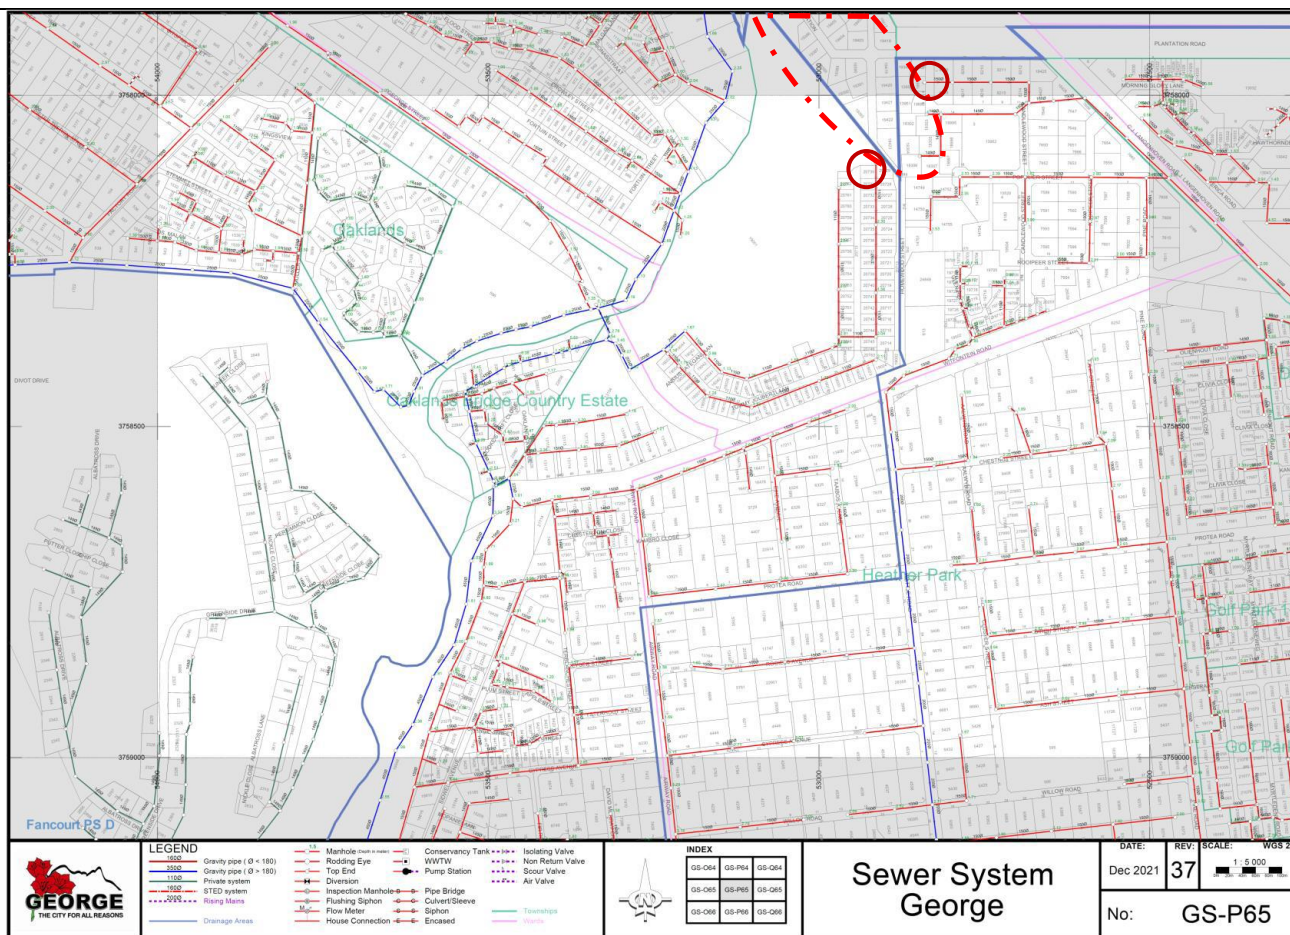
Proposed Sewer Connection Points – as pointed out by GLS Consulting Engineers.
